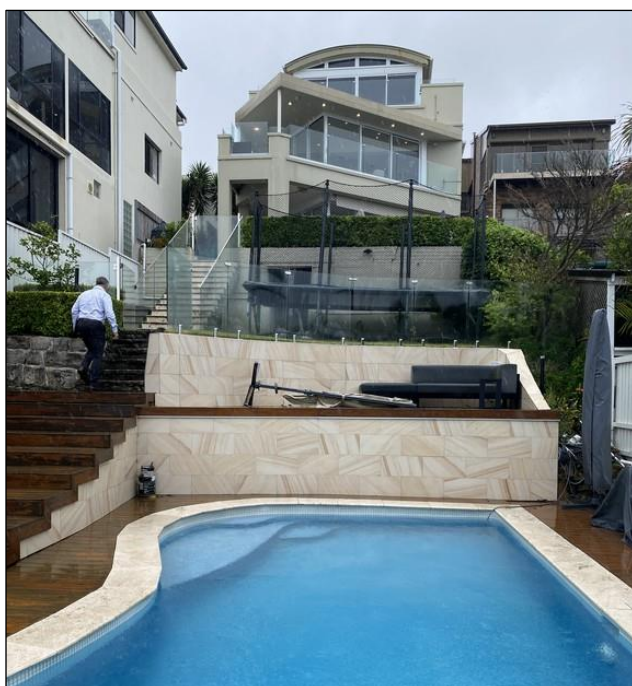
Rear of 23 Denning Street from the existing pool deck. 25 Denning Street to the left.
